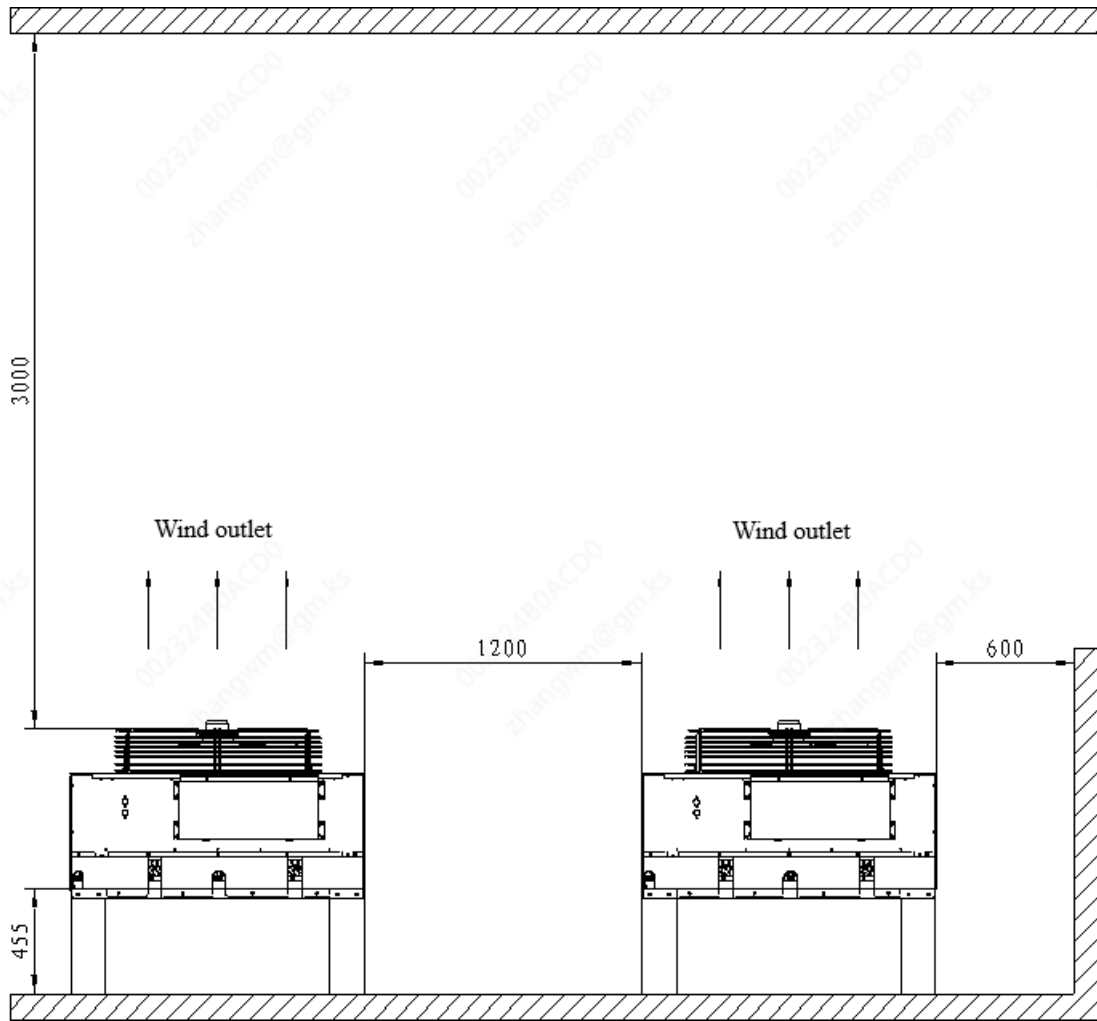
Horizontal installation space requirements (unit: mm)
